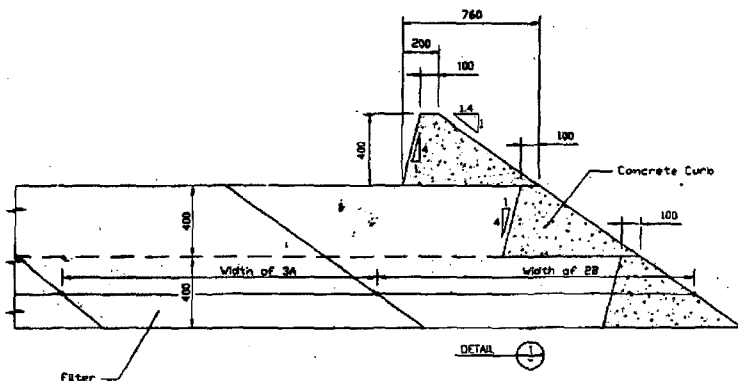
Curb element layout of Mohale dam (Godde and Droste, 2001)
